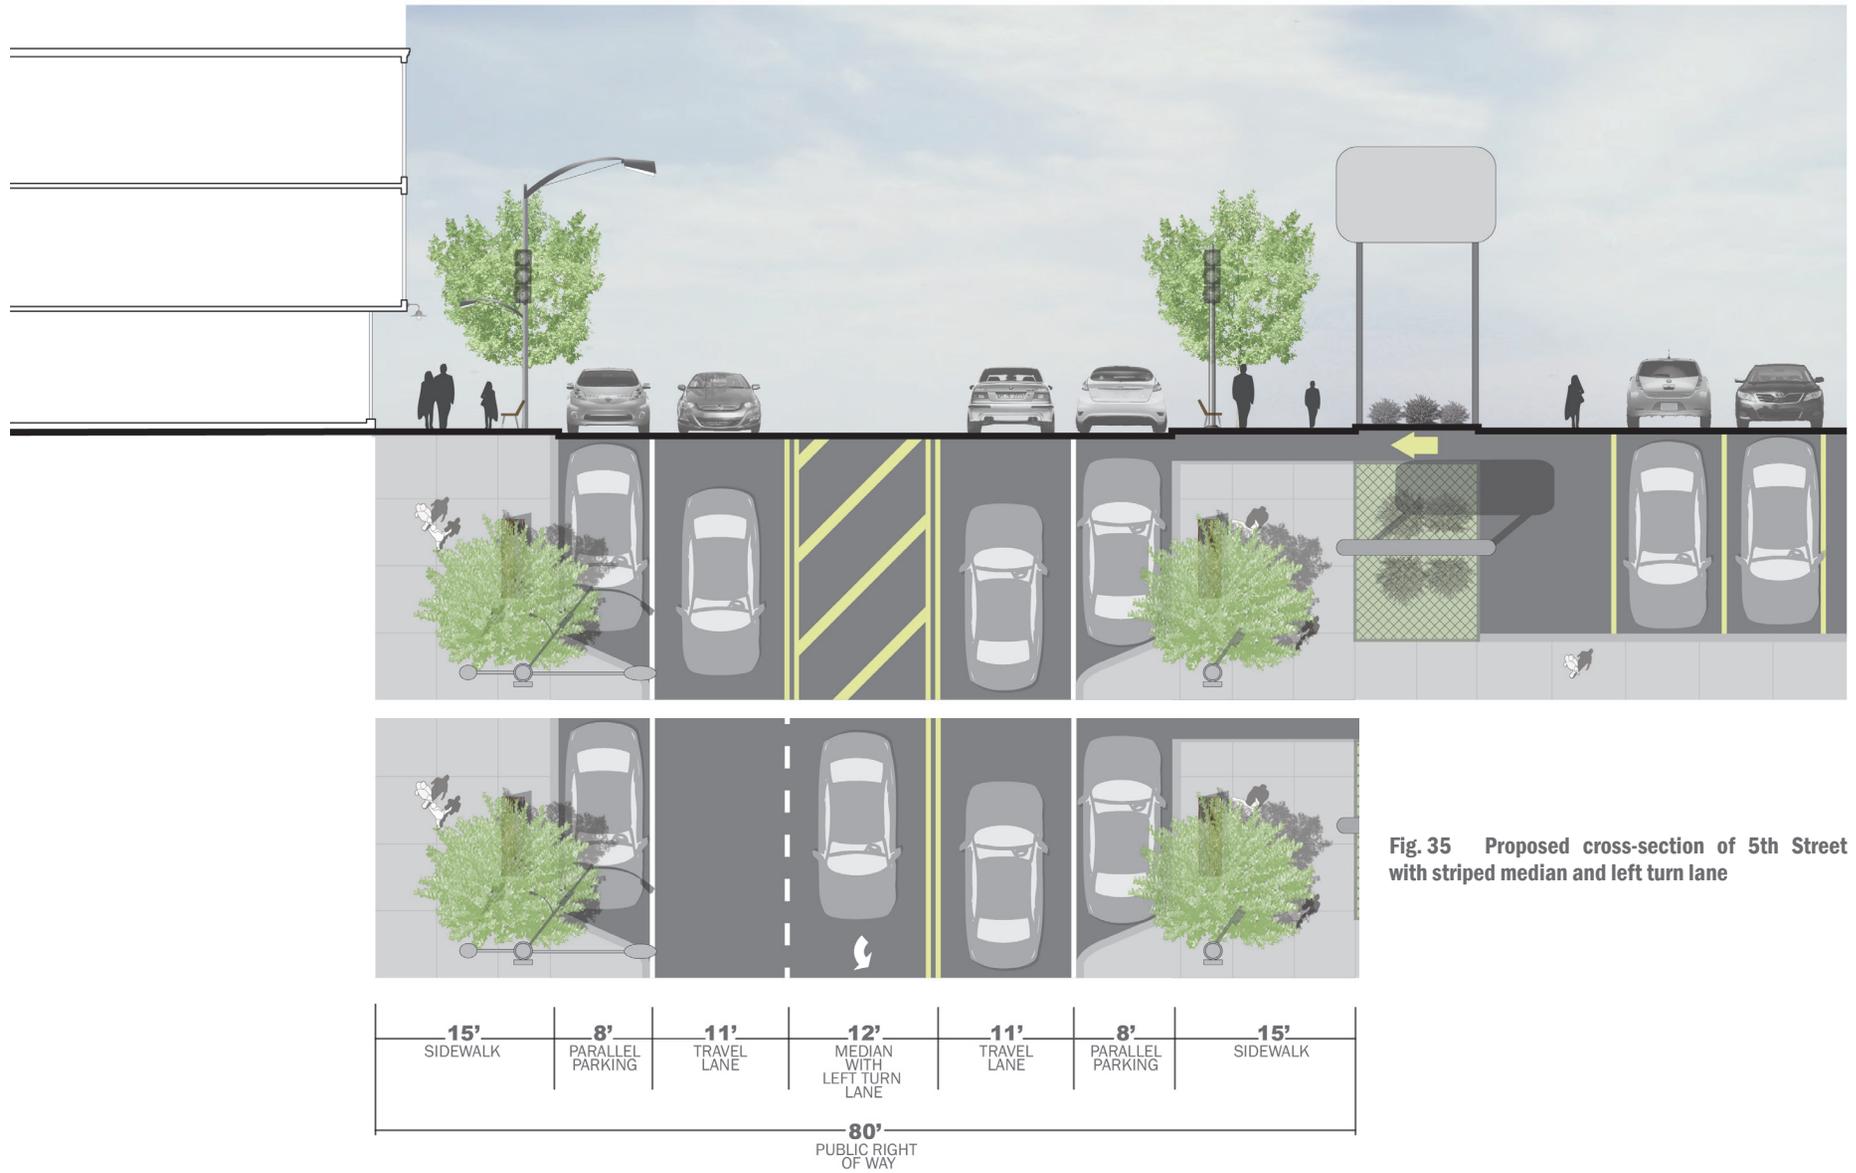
Proposed cross-section of 5th Street with striped median and left turn lane
